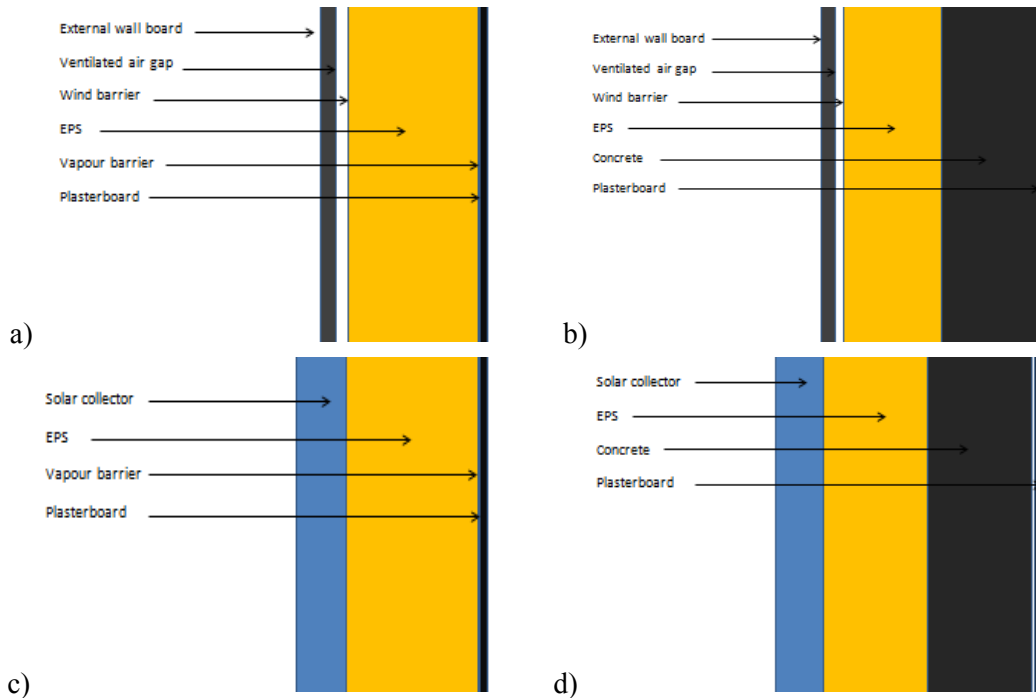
Conventional walls a) Wall A b) Wall B Solar walls c) Wall C d) Wall D
